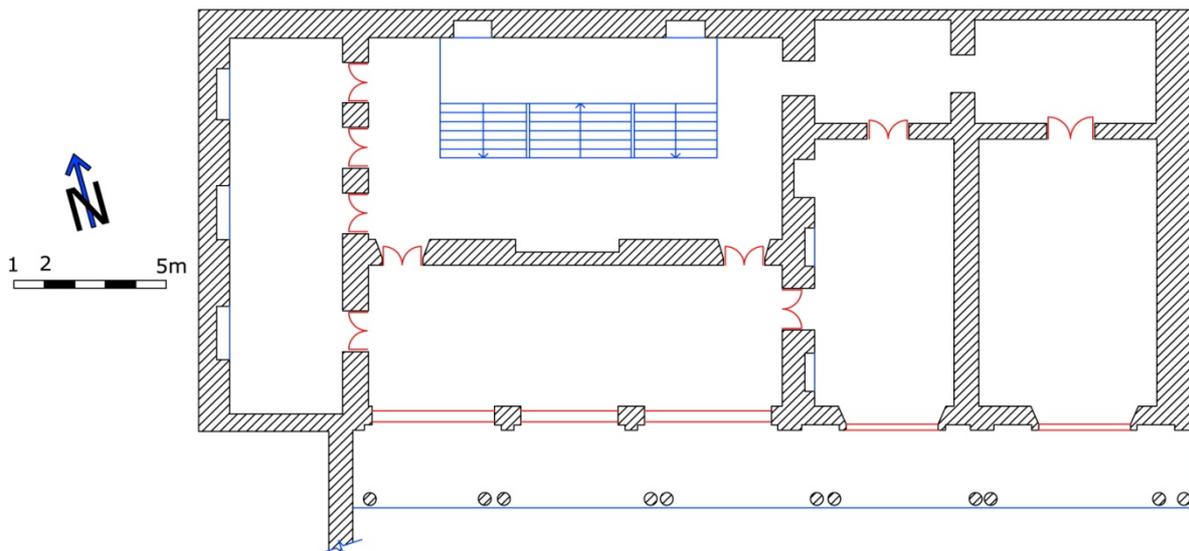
First floor plan, Source: Kasmaei 2005, p.81 (my drawings)
